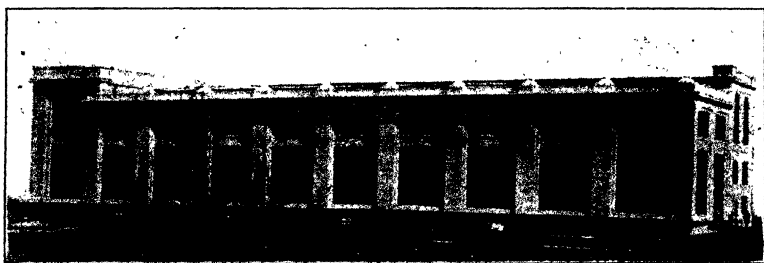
White River Station of the Puget Sound Power and Light Co. An Example of the Use of Concrete Walls.
